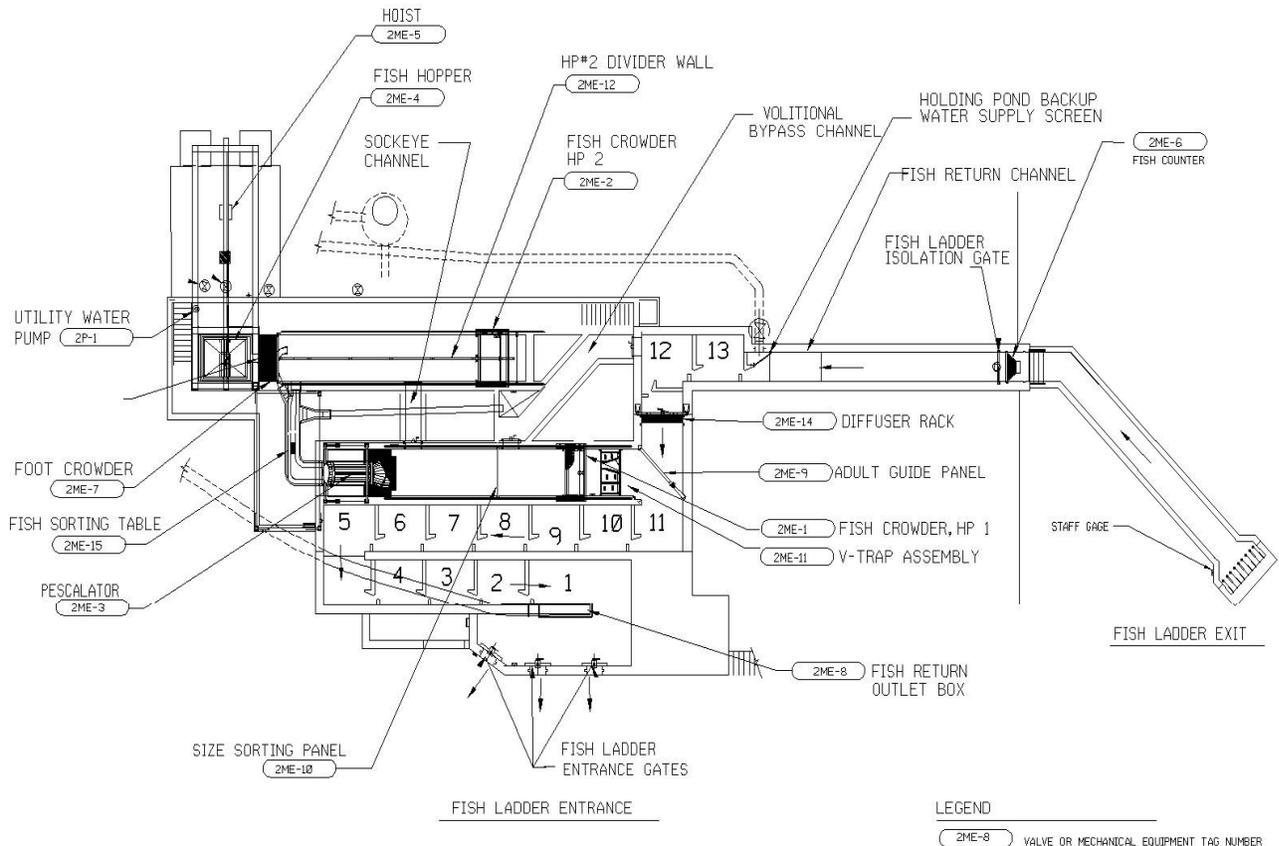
Layout of Landsburg Dam Fish Ladder and Sorting Facility
